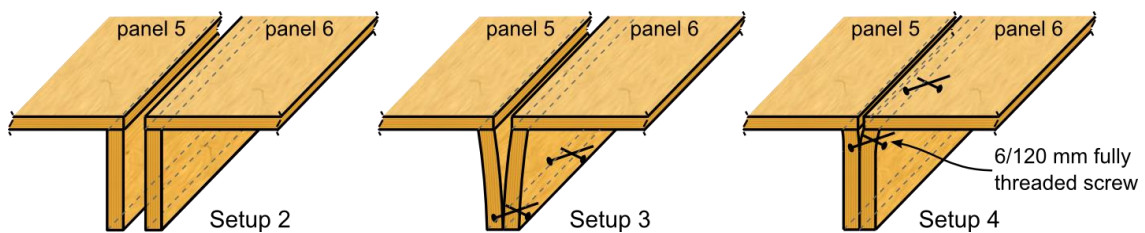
Connection of floor elements at the central beam-column joint: Setup 2) no connection; Setup 3) bottom flange connection; Setup 4) top flange connection
